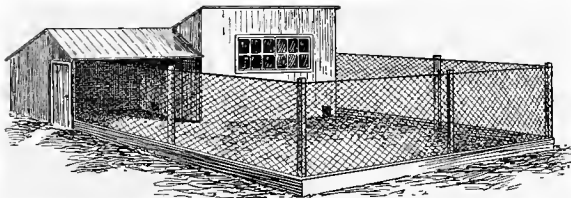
Single house and scratching shed: Showing an excellent arrangement of house, shed, and yard for a small flock.
